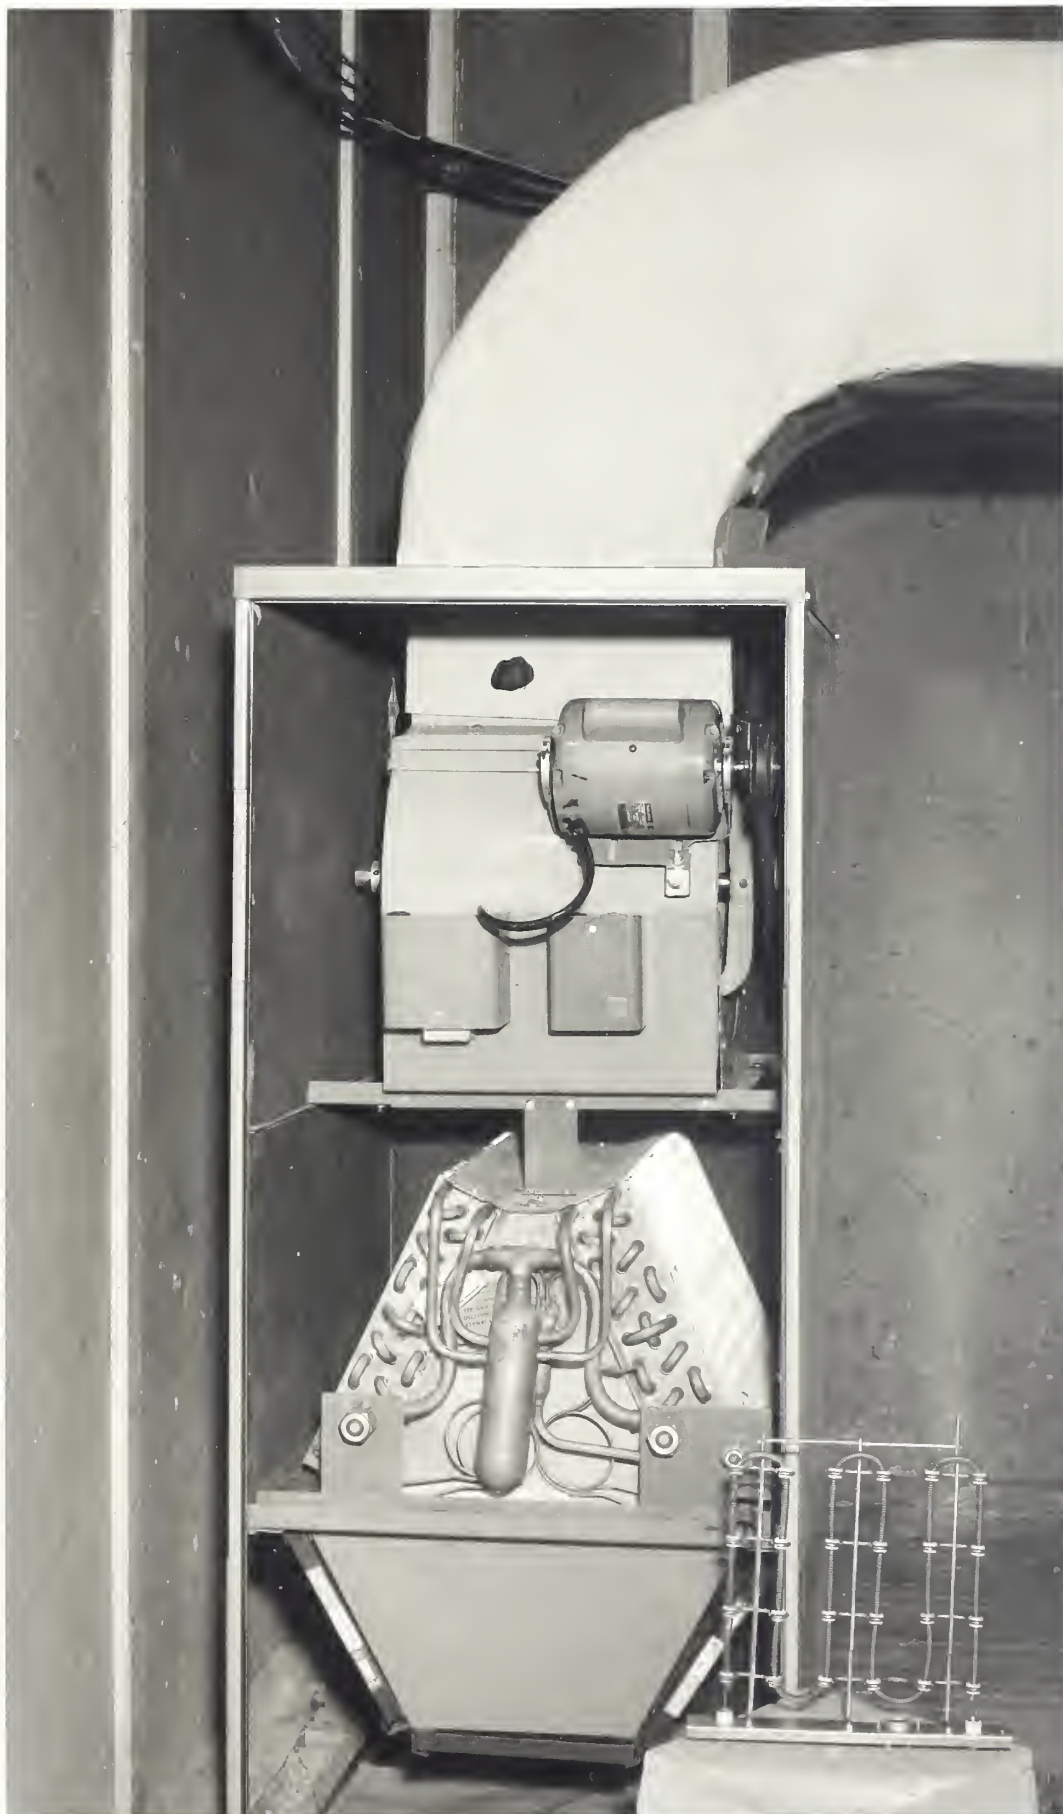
INDOOR UNIT - 5-TON HEAT PUMP
